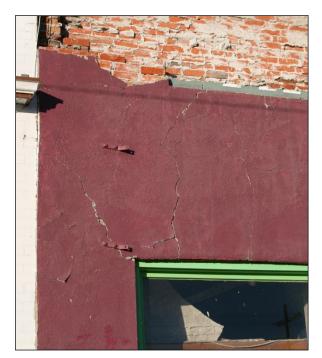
Part of the front wall of the Capitol Club that has not failed but is badly cracked. Note in the window that a part of an interior plaster ceiling has failed.
